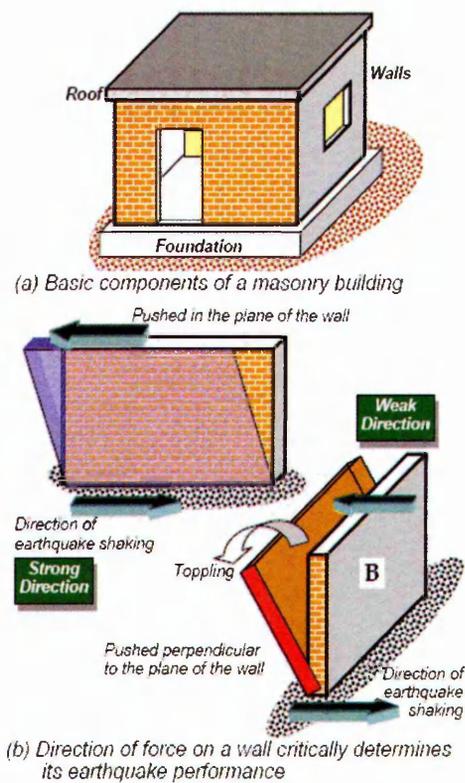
Basic components of a masonry building: walls are sensitive to direction of earthquake forces (IITK-BMTPC, 2003)
